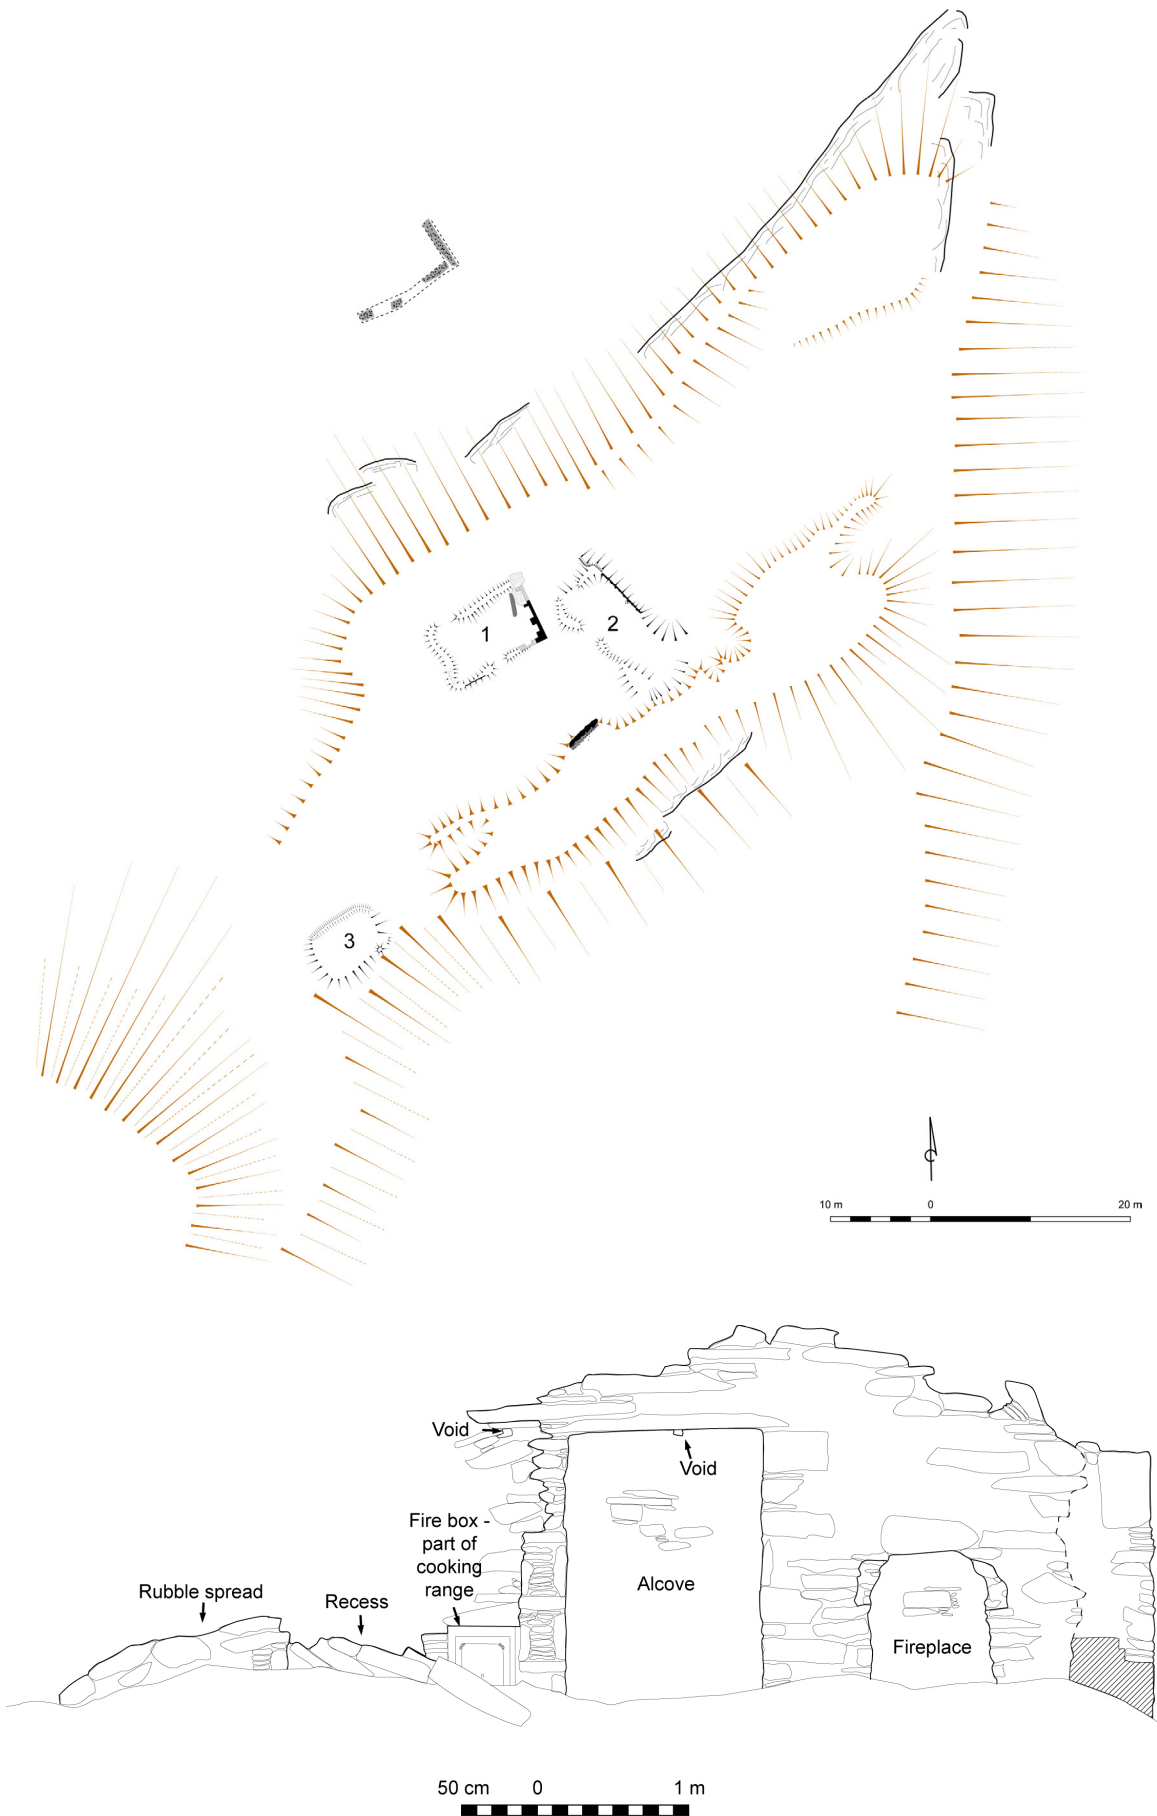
Slate Hough farmstead plan (above), and elevation of building 1 (below).
